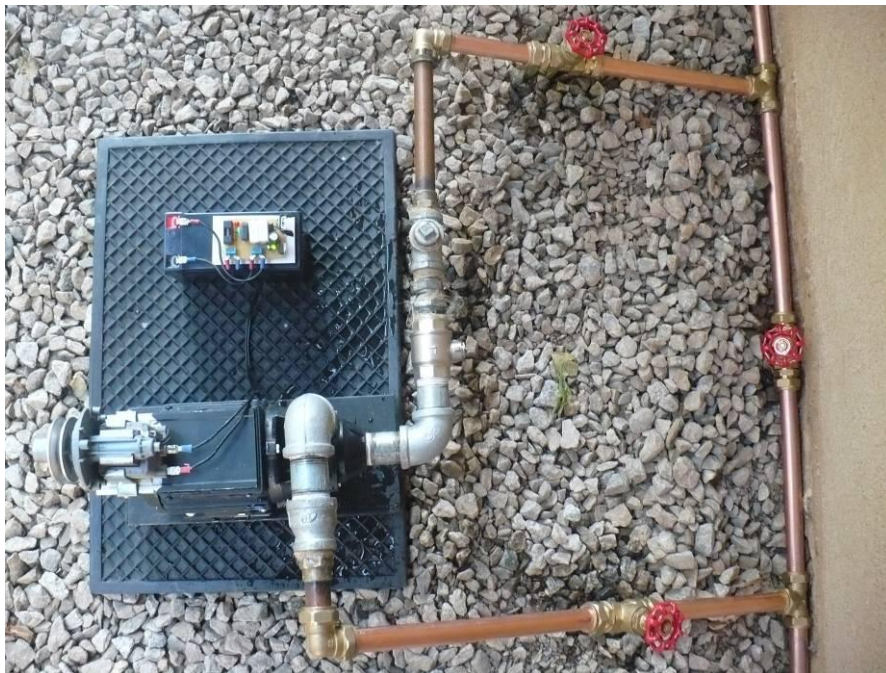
Plan view of installation at Singa drive 55, Matumi, Nelspruit
